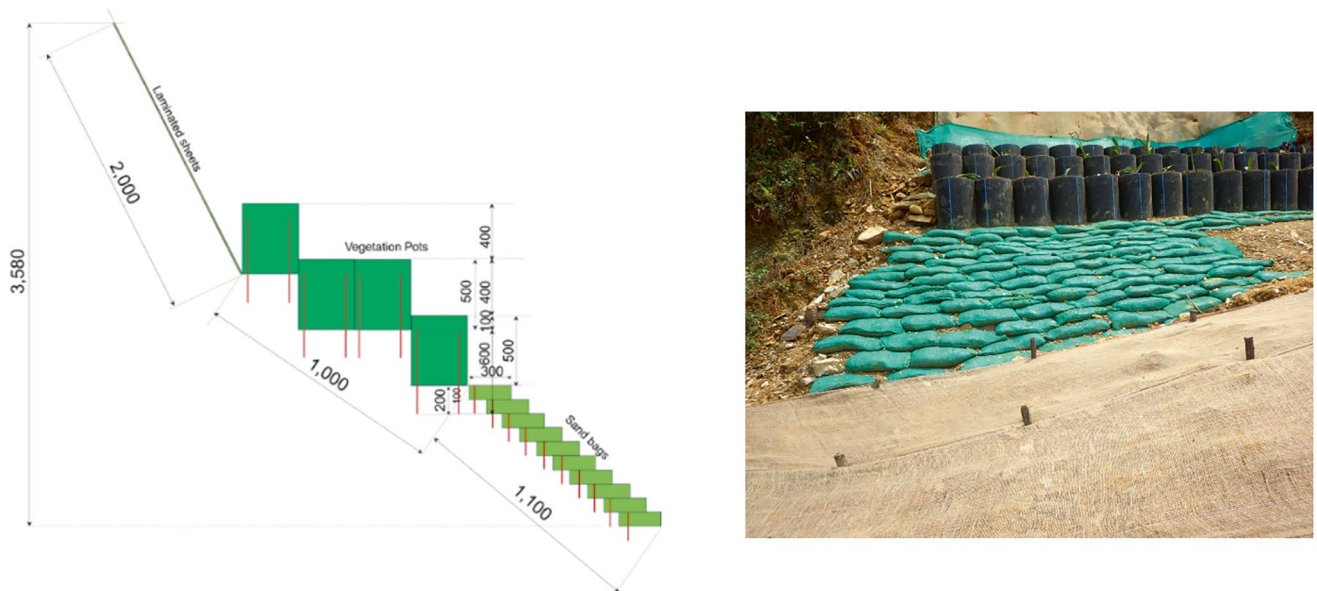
Vegetation works at the landslide prone area (left: sandbag planting colored light green, right: spread planting, pot planting, sandbag planting from toe)
